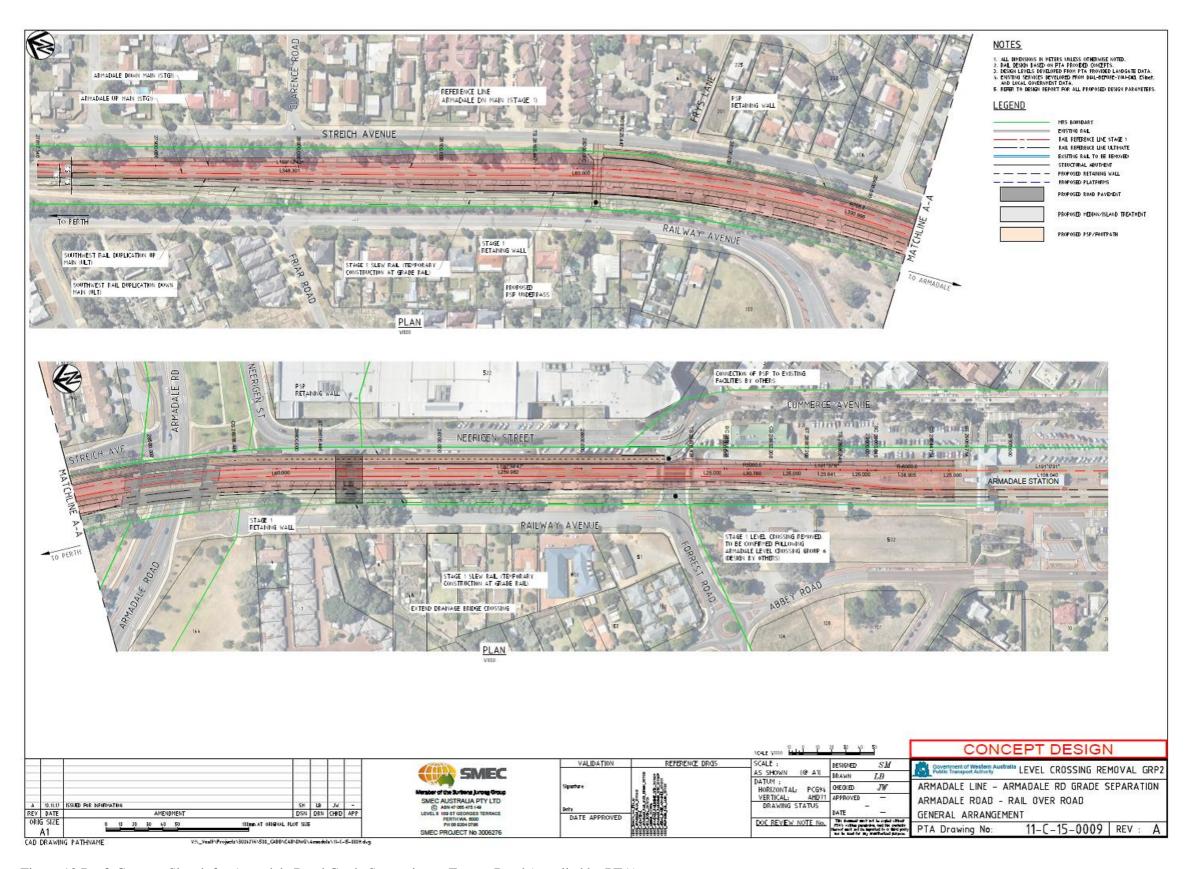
Draft Concept Sketch for Armadale Road Grade Separation at Forrest Road (supplied by PTA)
